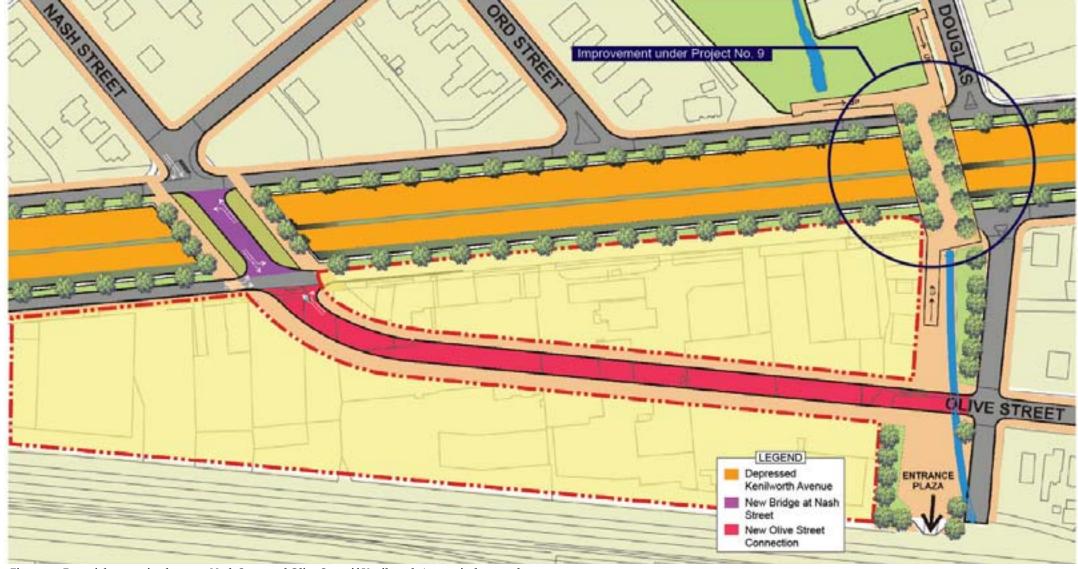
Potential connection between Nash Street and Olive Street if Kenilworth Avenue is depressed
